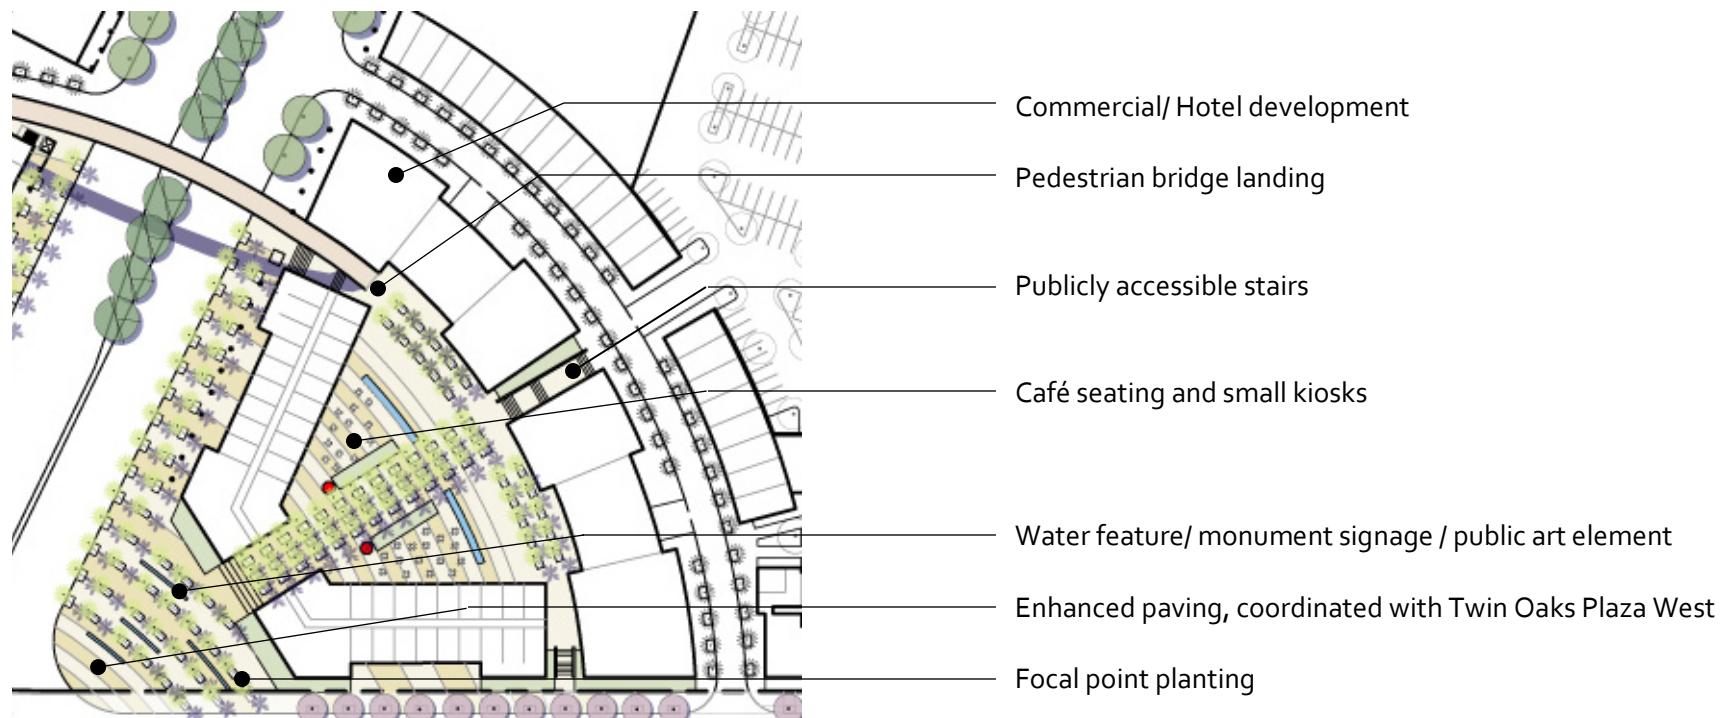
FIGURE VI.K: Twin Oaks Plaza (East) Conceptual Plan
